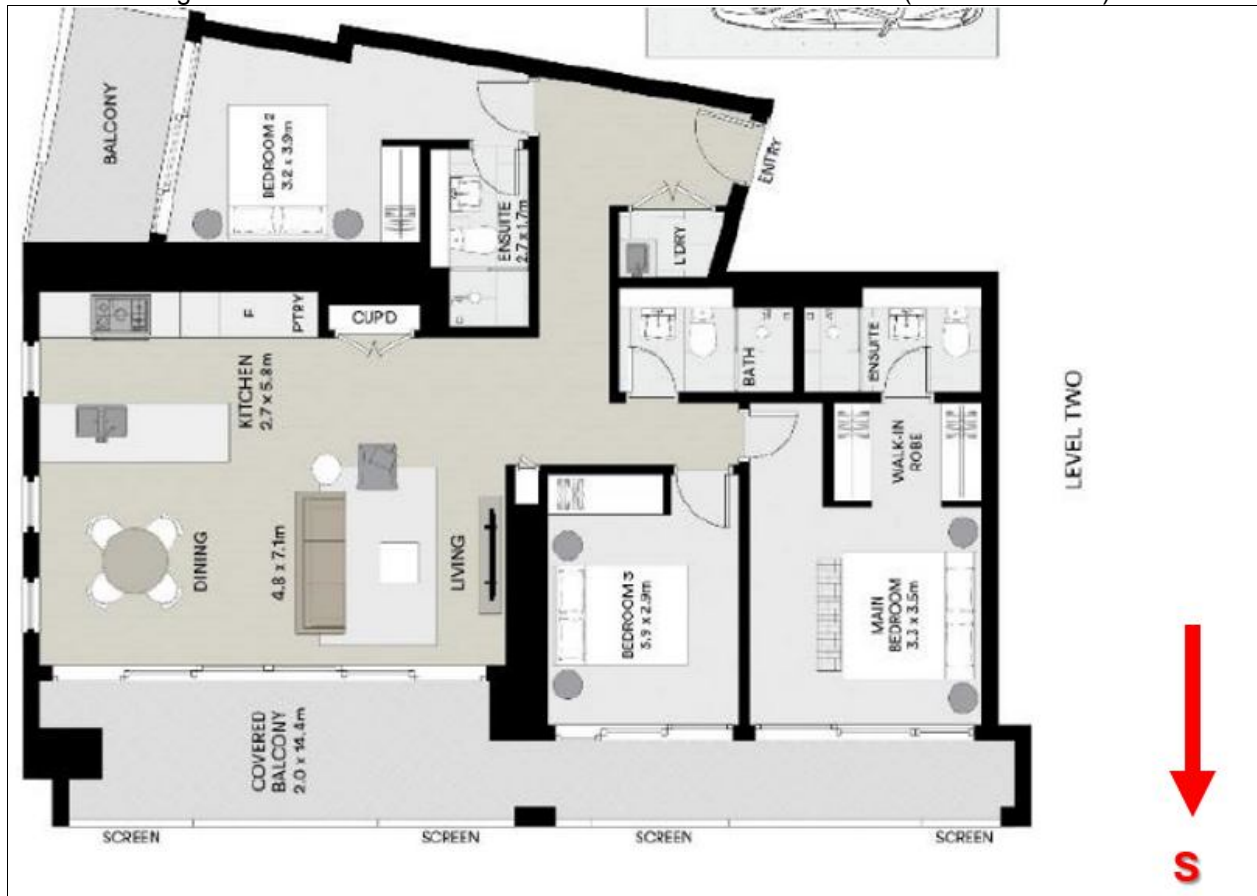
Floor plan of Level 2 unit at 1 Marshall Avenue. (Source Domain)
